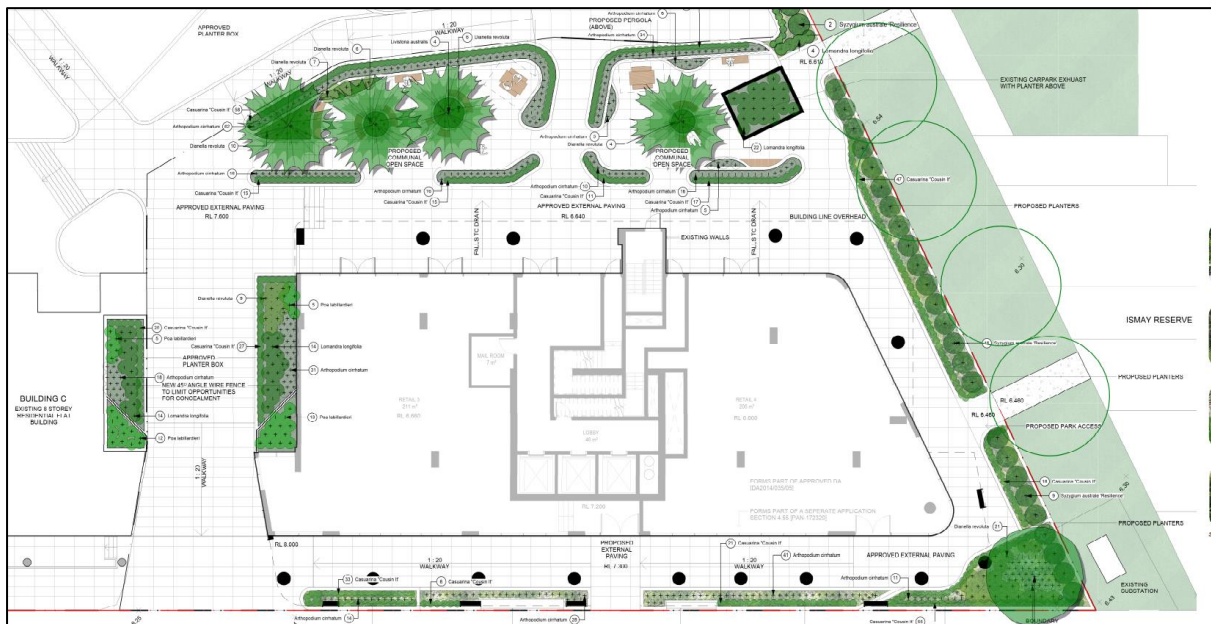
Proposed landscape plan showing Communal Open Space area to the north
